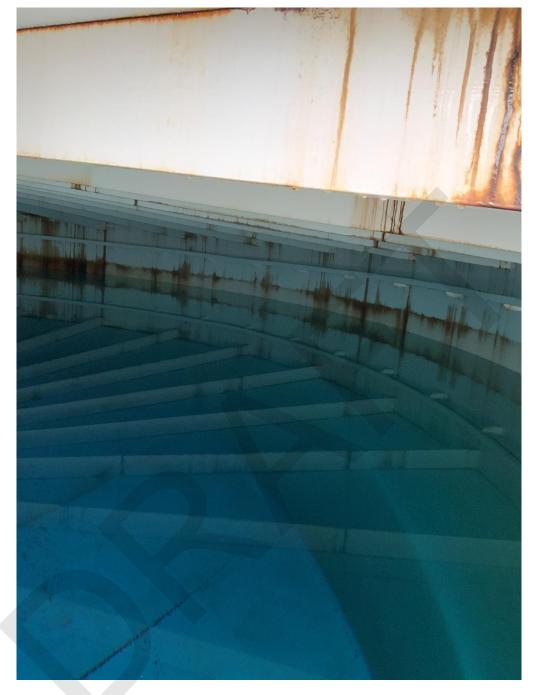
Tank Interior Roof Framing Corrosion
